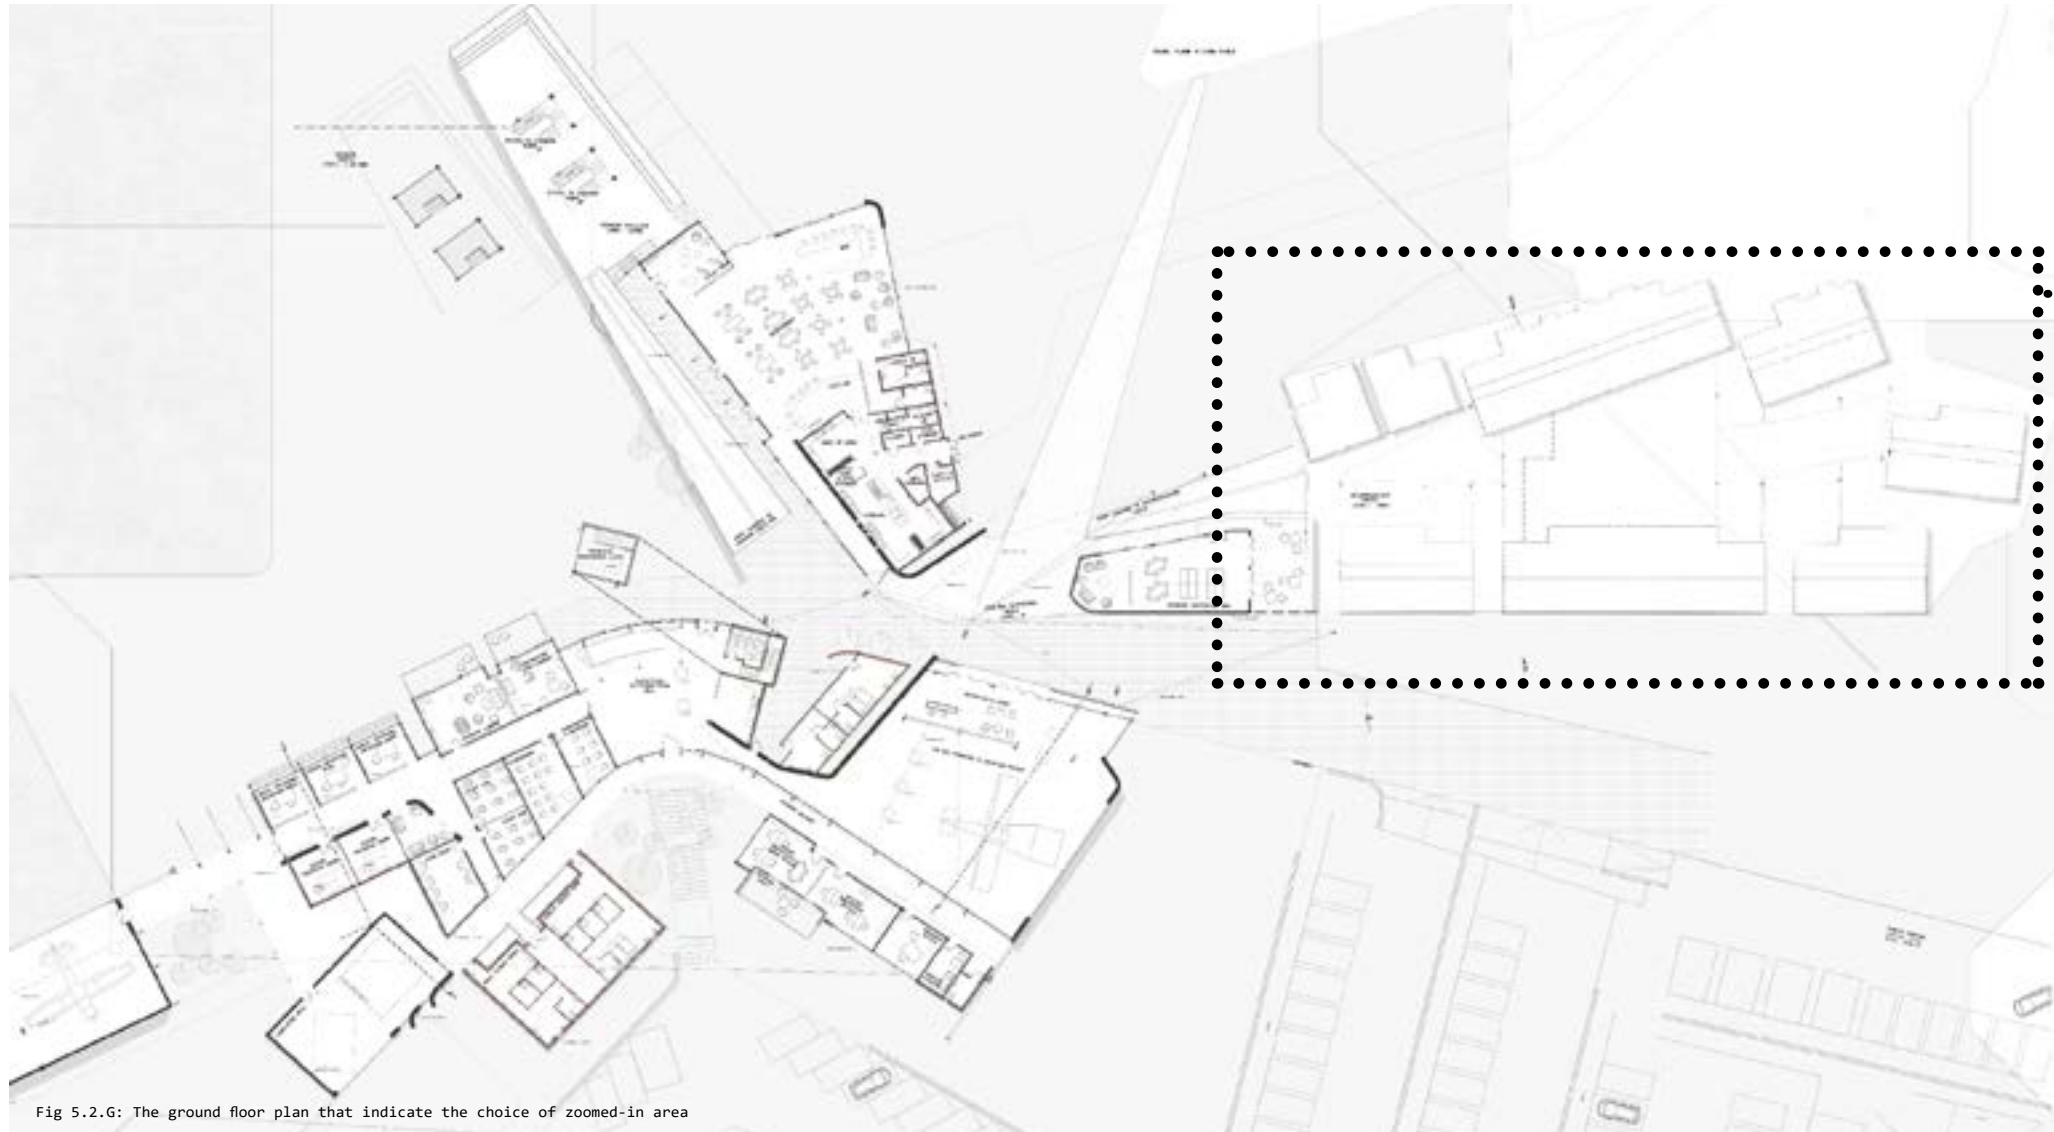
G: The ground floor plan that indicate the choice of zoomed-in area
